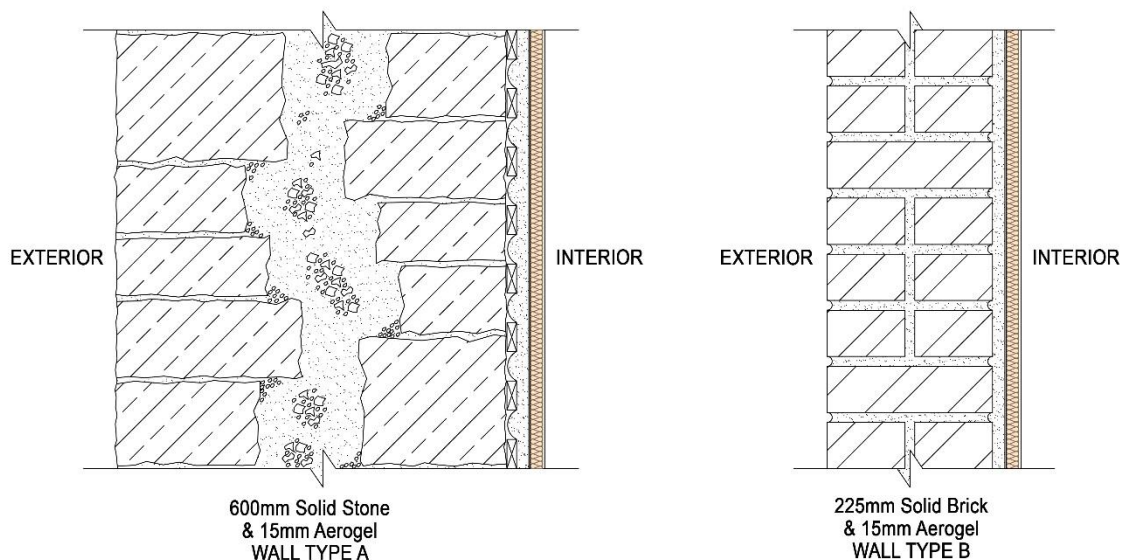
Typical section through a solid stone wall and solid brick wall.
